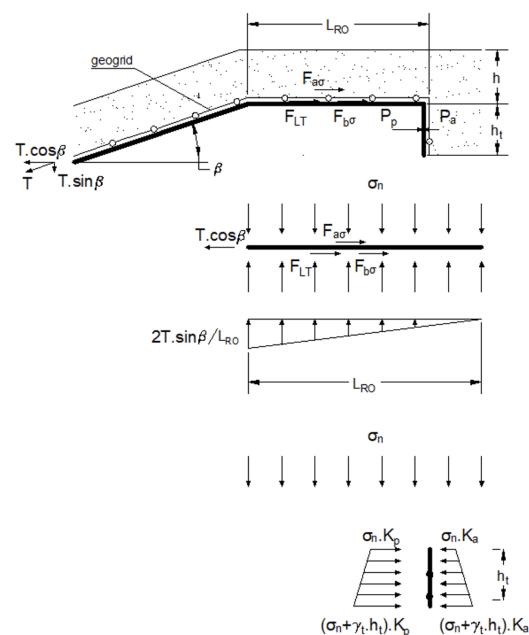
Forces and stresses occurring when anchoring a geogrid with anchoring trench
